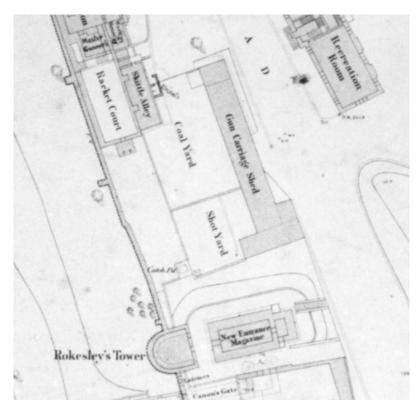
Detail from War Office plan of 1884, showing the east stable used as a gun carriage shed, and coal and shot yards established on the site of the demolished west stable. (NA WO 78/2451.)
